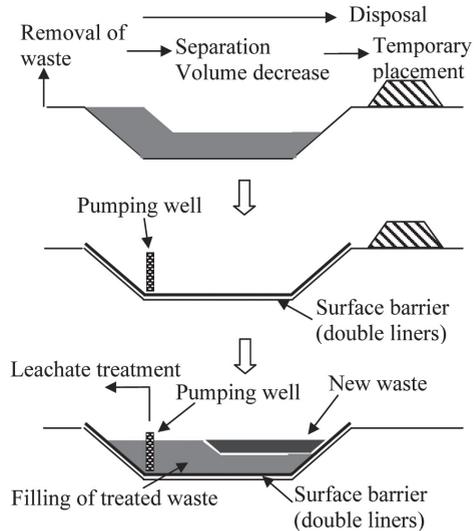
Removal (temporary) of existing waste and construction of double liner system.
